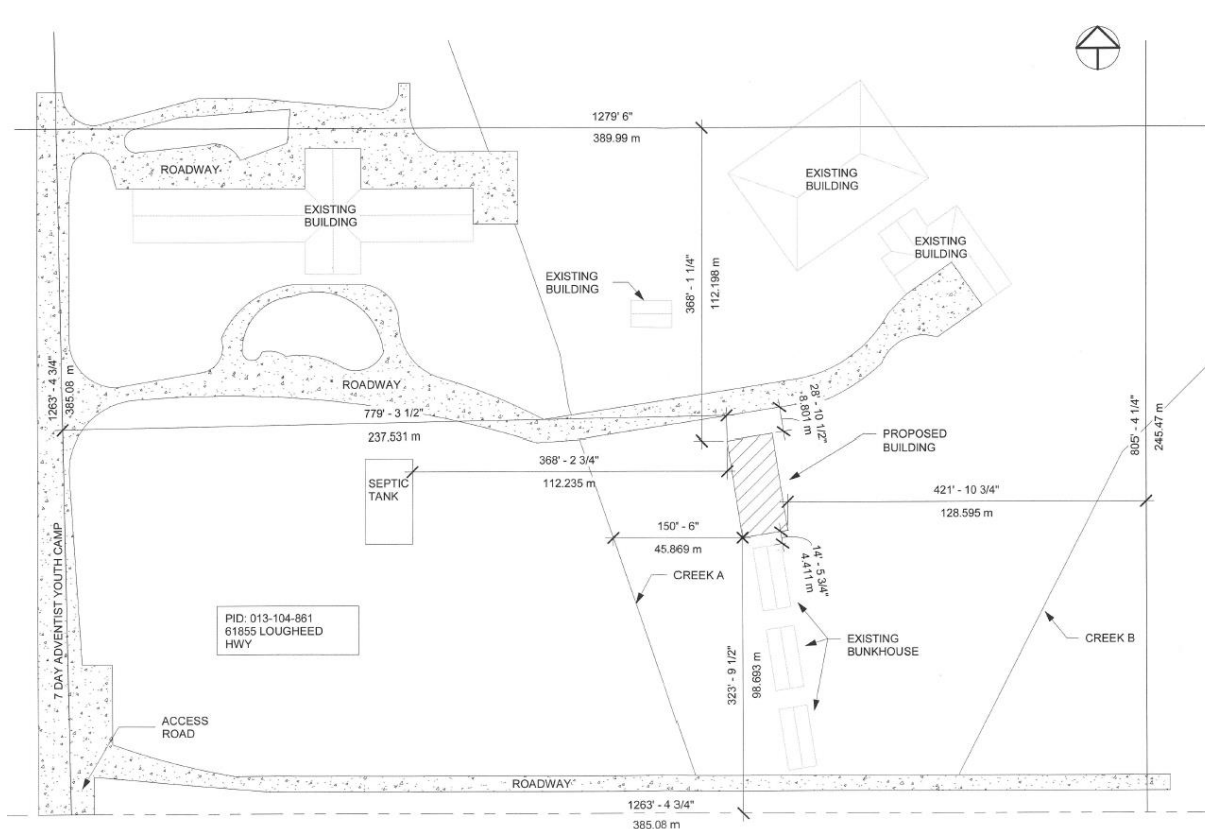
Site plan shows location of existing bunkhouses and proposed building.
